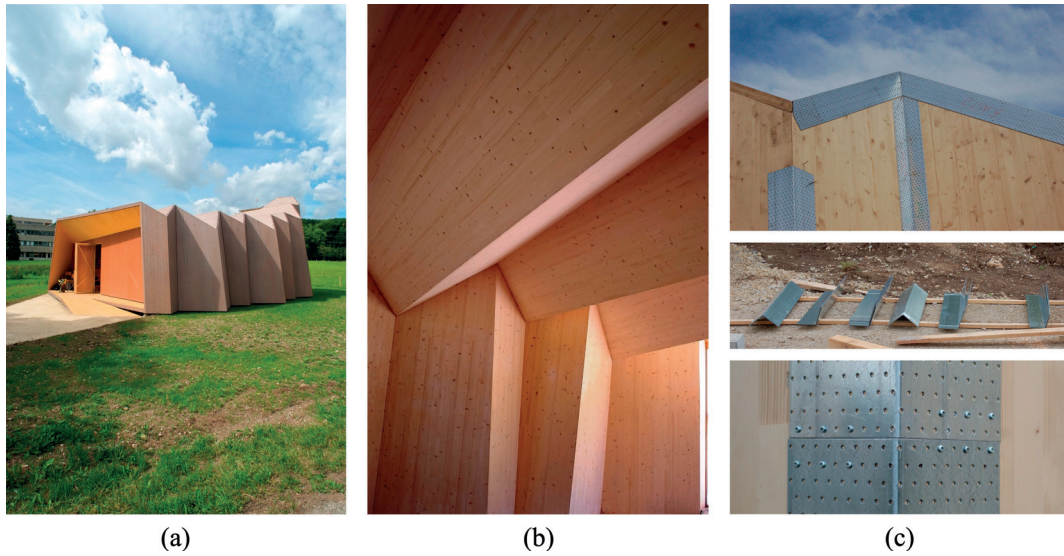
Saint Loup Chapel [BW08b] : (a) External view, (b) Internal view and (c) Splice steel-plate connectors for interior and exterior folds
